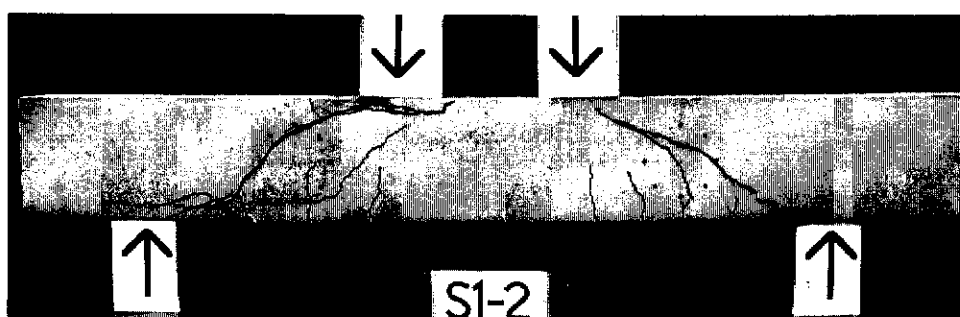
Crack Pattern of the Back Face of Beam S1-2
